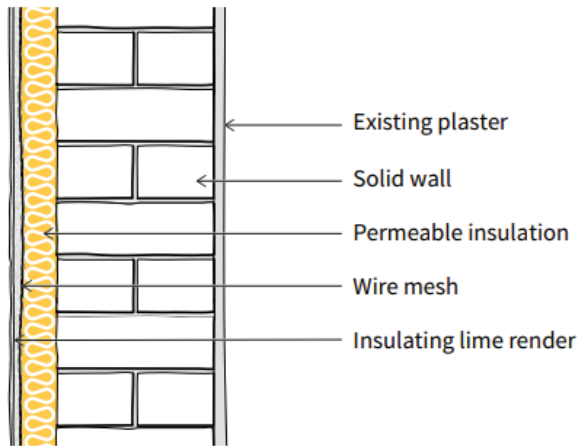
EXTERNAL SOLID WALL INSULATION (HE INSULATING SOLID WALLS 2016)
